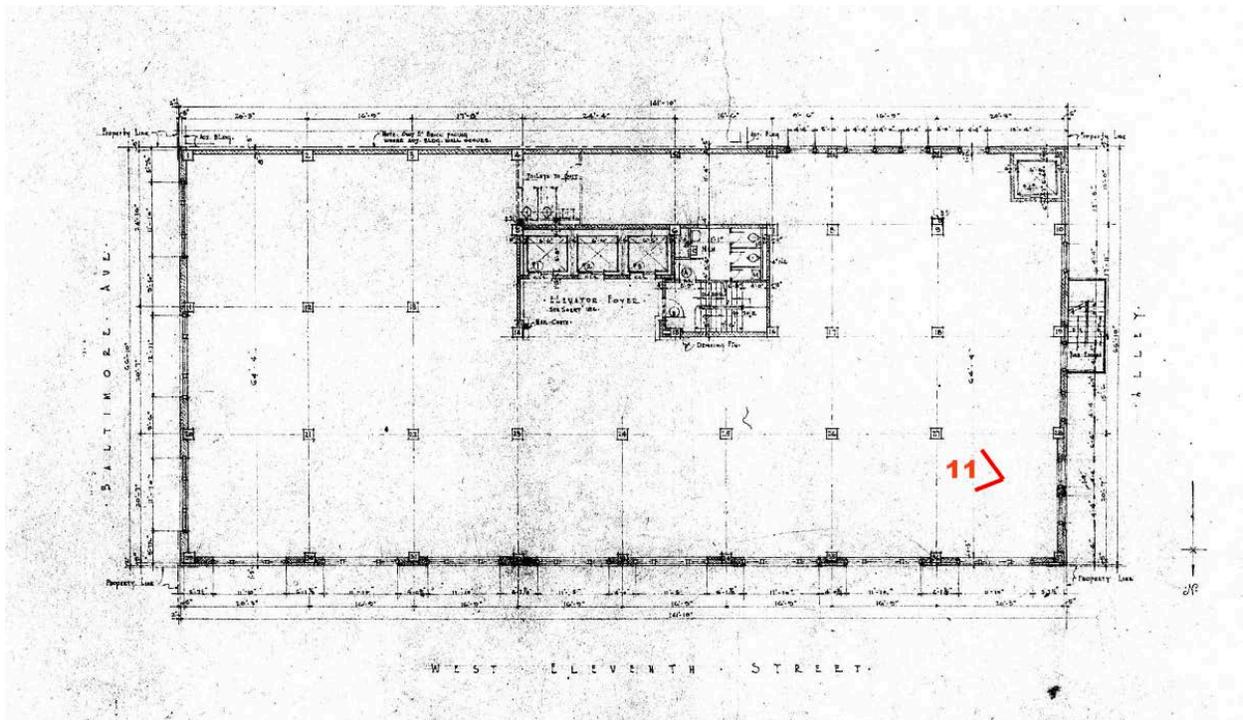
(above): Photo Key ground floor. Figure 5 (below): Photo Key, sixth floor
